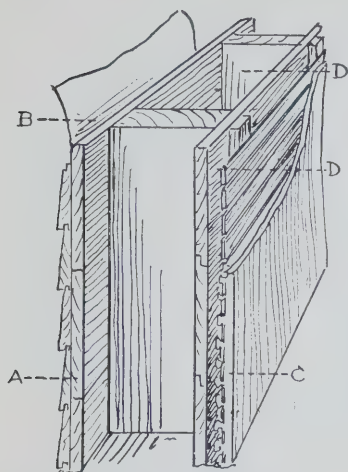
Section of a wall. A, Boards. B, Paper. C, Plaster. D, Dead air spaces. How many layers of non-conducting material are there in this wall?
